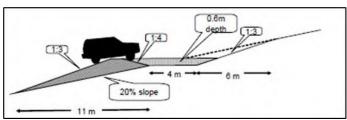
Whoa-Boys – Twenty Percent Slope – Cut and Fill – Cross-Section
